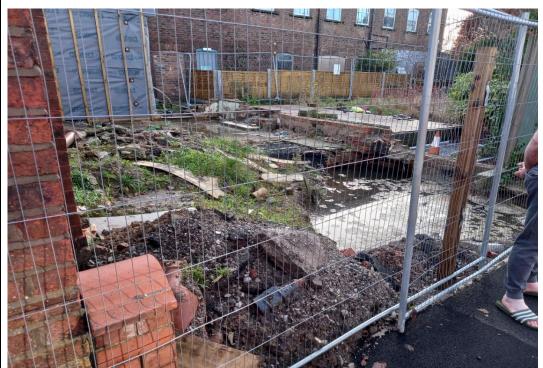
Site where 18 Hobson Street was previously demolished. Sink hole (open section of culvert) to the right of the photo demonstrating water levels near ground level during a dry day (not raining) and not flowing freely downstream.
